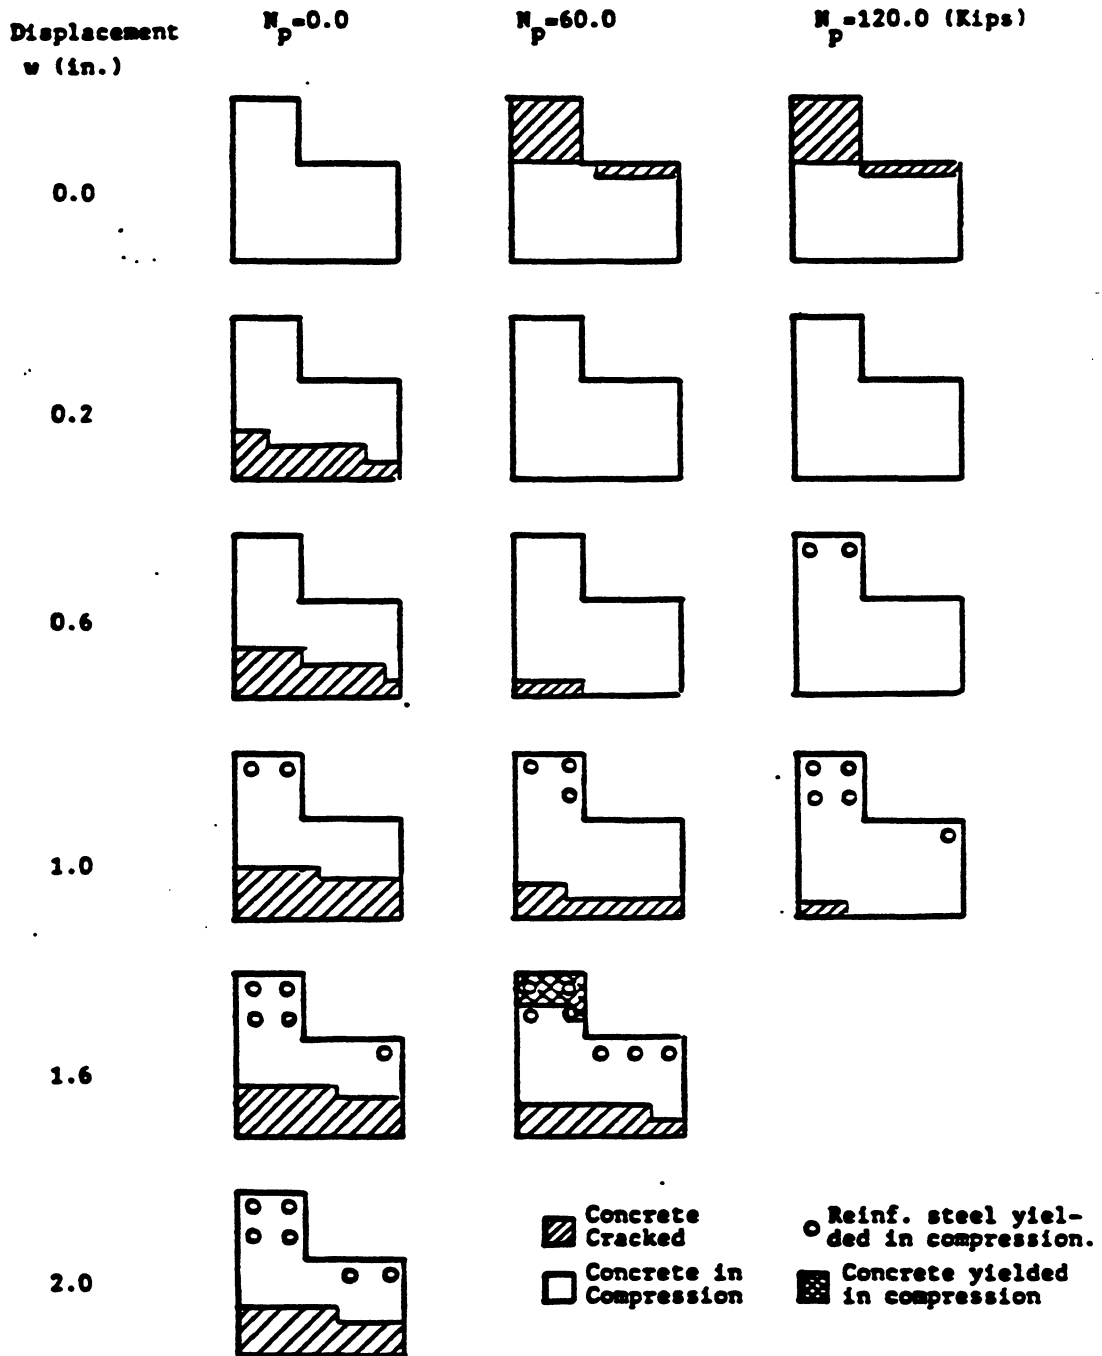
Biaxial Bending of Reinforced and Prestressed Concrete Columns with Irregular Cross Section. Crack Patterns and Material State at the Base Section.
